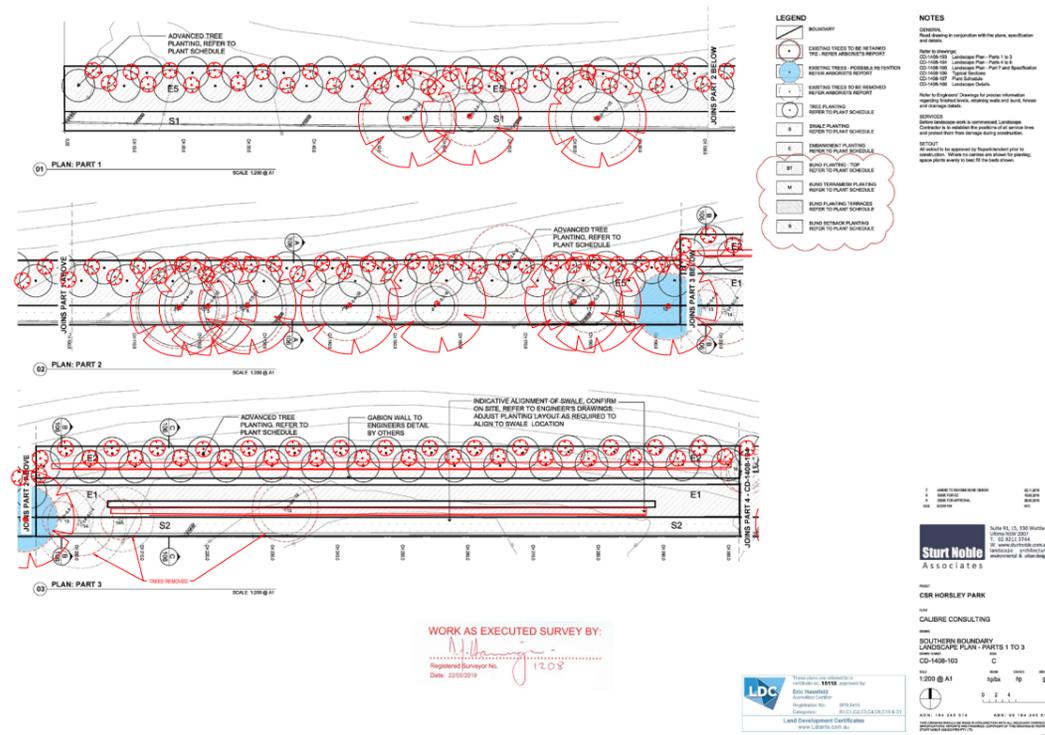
WAE Southern Boundary Landscape Plan - Parts 1 to 3 (Source: LDC & Sturt Noble Associates)
